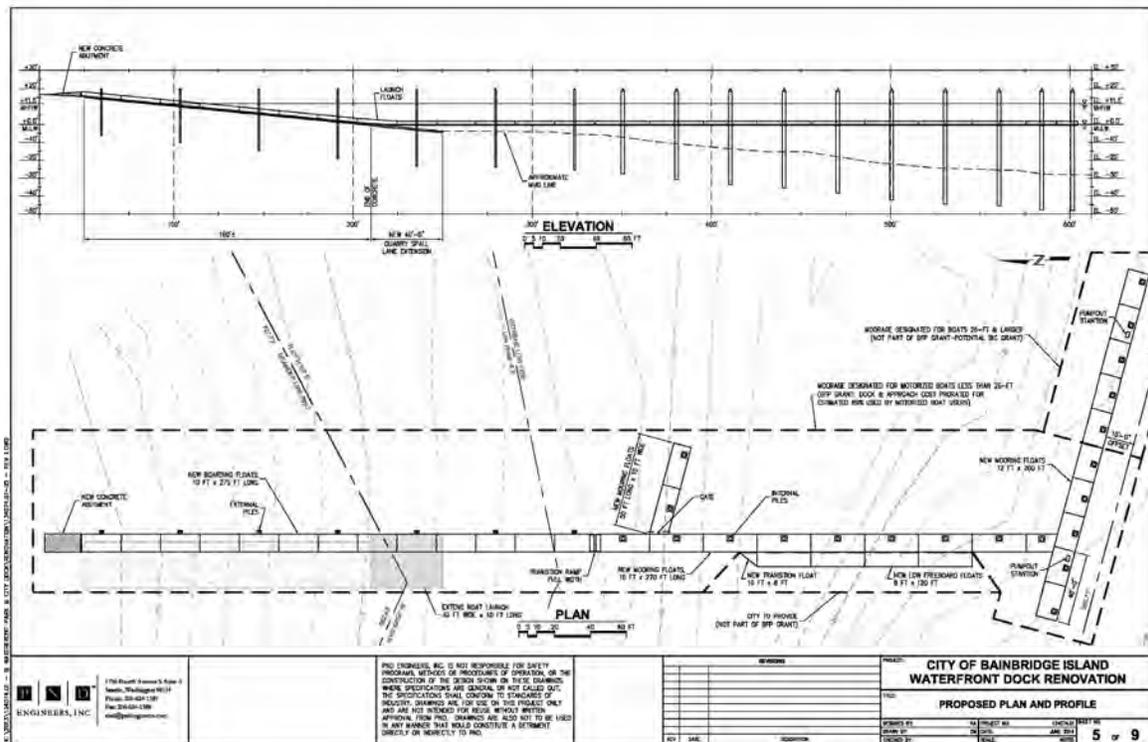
City dock is proposed for major renovation, with wider floats, an extended dock with a larger mooring platform, low-freeboard floats for paddling and rowing craft, and an extended boat launching ramp. (Image source: PND, Inc.)
